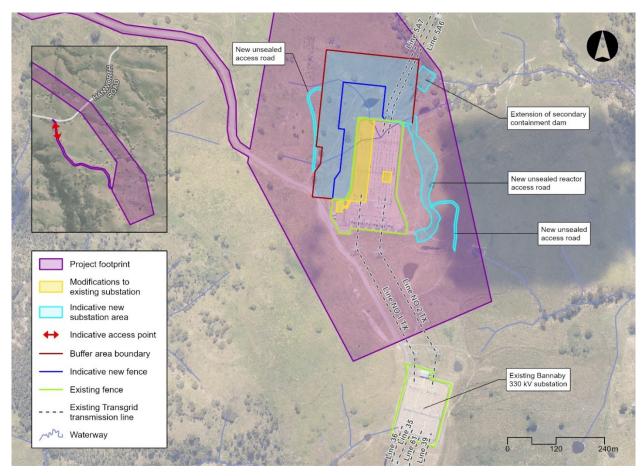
Indicative layout of the modified Bannaby 500 kV substation showing location of the existing access road from Hanworth Road
